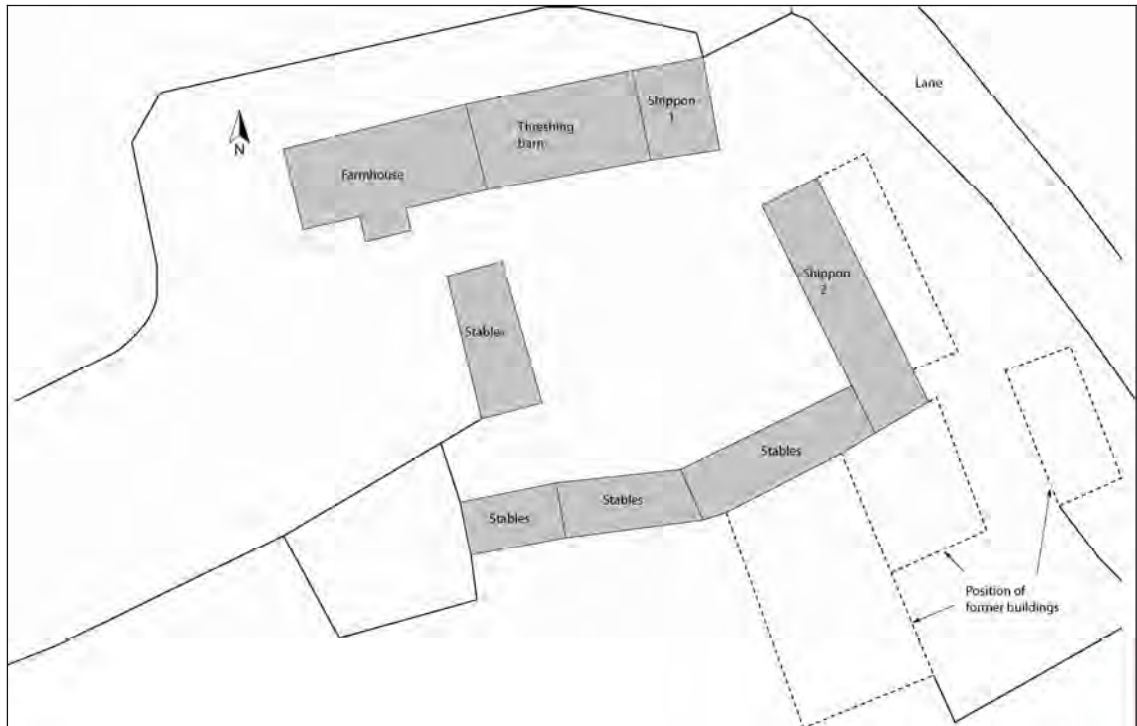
Plan of the existing layout of the buildings at Higher Ley Farm (not to scale)
